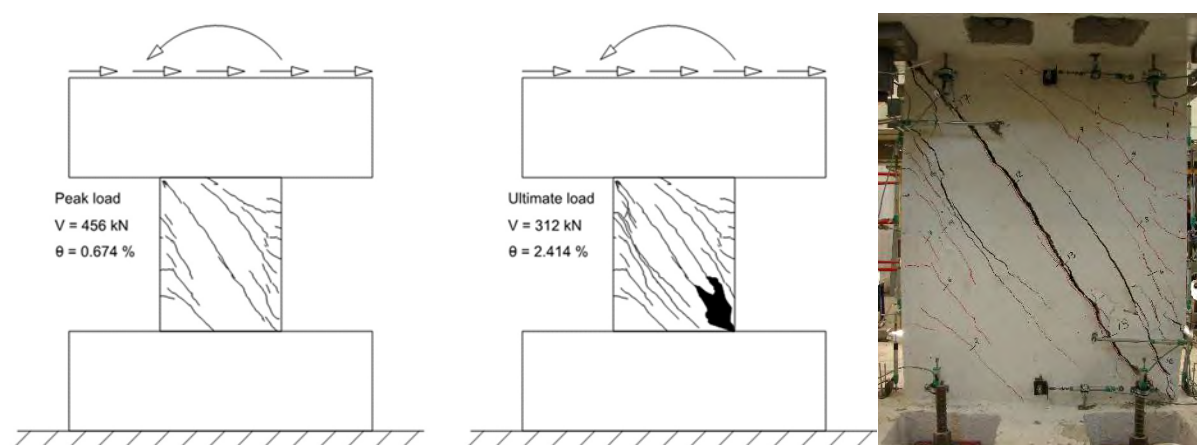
Crack diagrams of specimen RB1: at peak load (left) and failure (middle). RB1 specimen's post-test photo (right).
